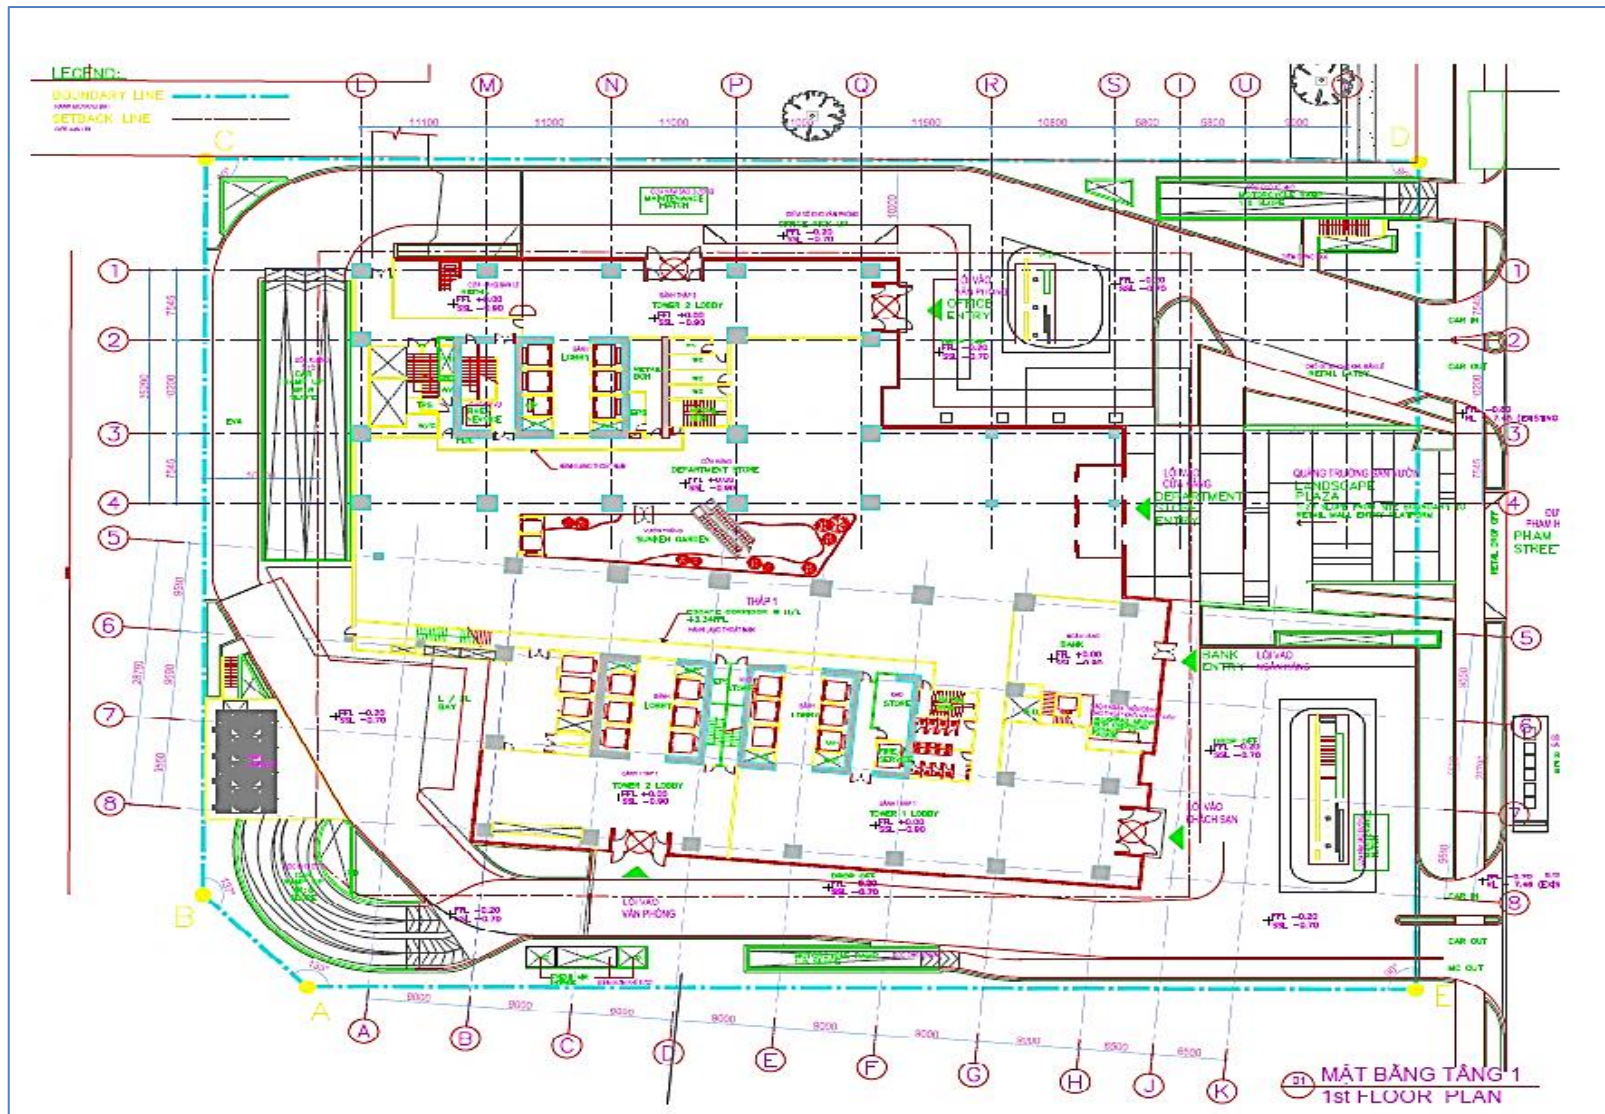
Typical floor plan from 1<sup>st</sup> to floor plan
